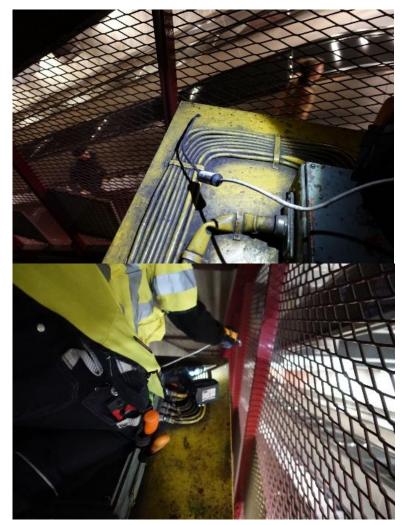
Pictures of the installation taken from the elevator roof. Shows the connection solution made during the first installation and how the wires are drawn down to the elevator car. The converter and other electrical connections are placed in the white dust- and waterproof box seen on the lower pictures. [G.1]
